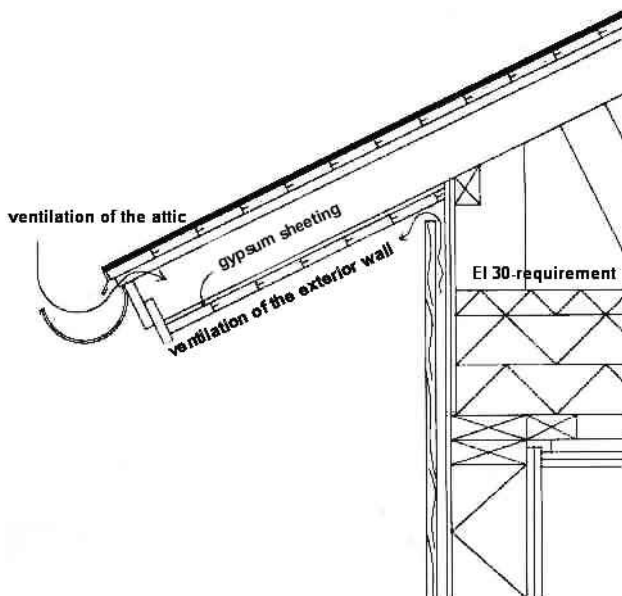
A tested fire-resistant eave structure. Ventilation of the exterior wall happens below the closed eave and ventilation of the attic takes place at the edge of the eave. Boarding alone is usually not sufficient on the bottom surface of the eave. The fire safety of the bottom surface of the eave and the exterior wall butting against the attic is improved by adding gypsum sheeting.
